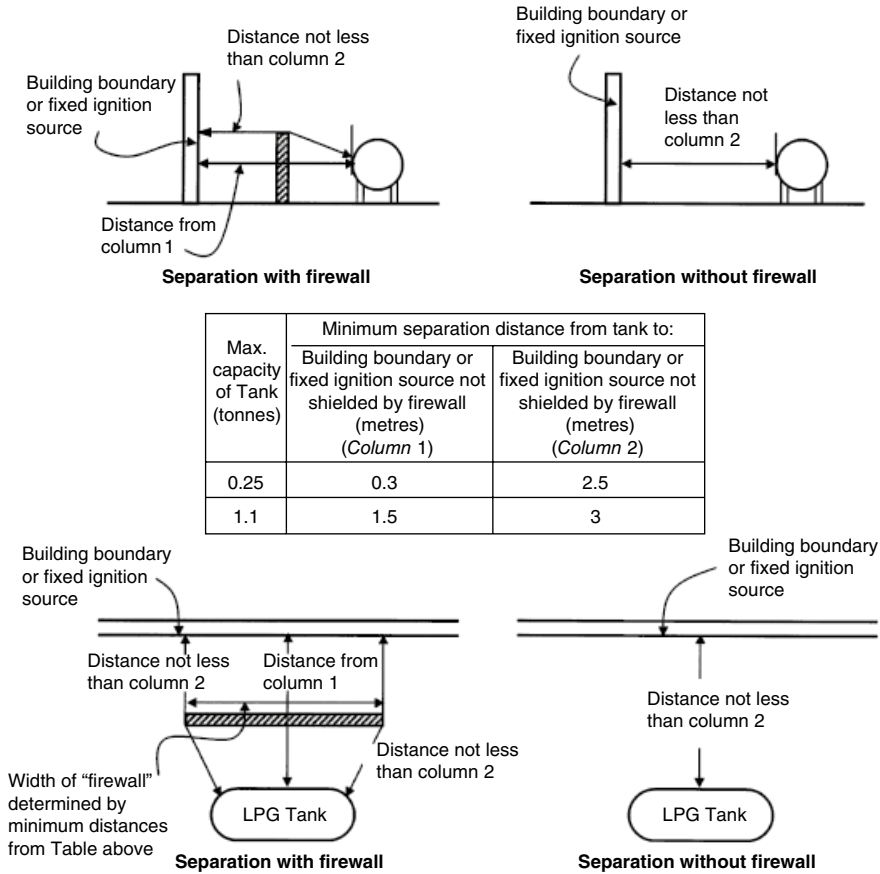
Separation of LPG tank from building boundary or fixed source of ignition with and without firewall.
